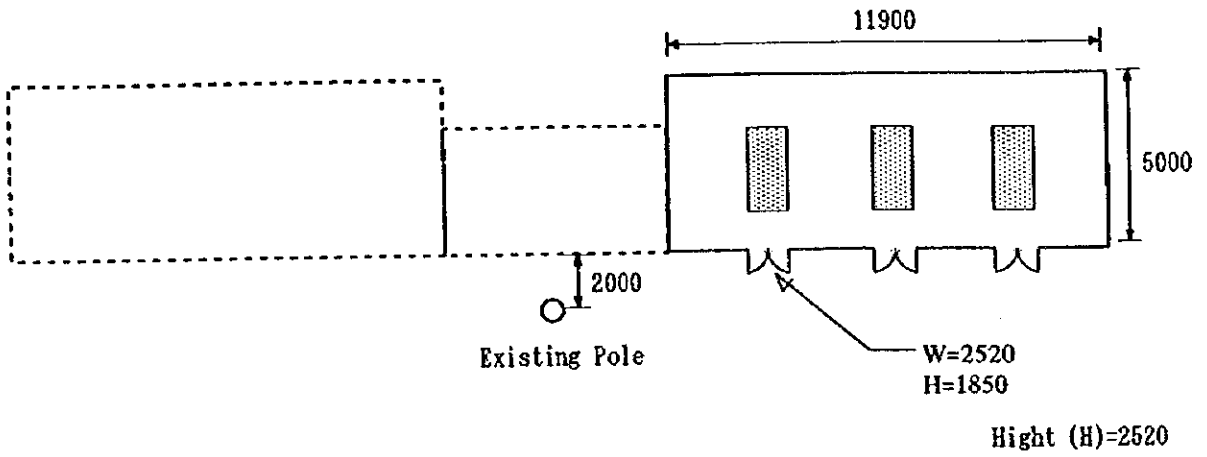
11 Layout Drawing of Munkhairkhan
